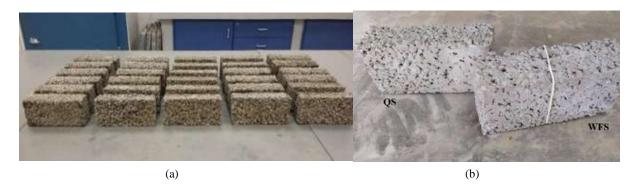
Specimens of pervious concrete paving blocks; (a) after demolding; (b) Pervious paving blocks with QS and WFS after 28 days.
